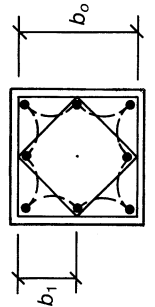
Horizontal cross-section of column with non-uniform distribution of confining stresses
